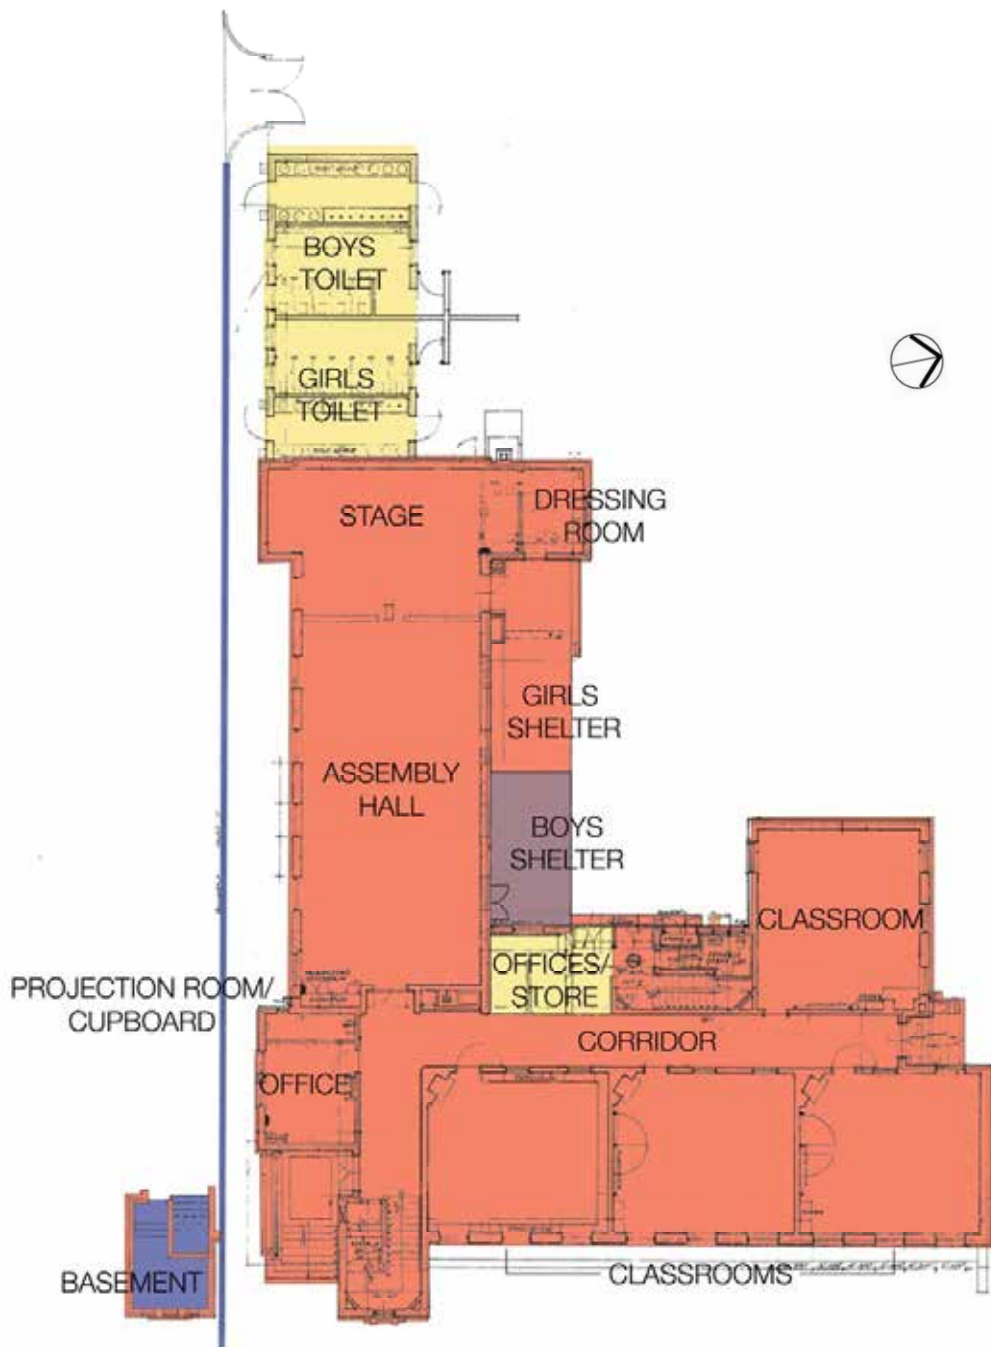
Significance of spaces in Fort Street Public School – Ground floor
